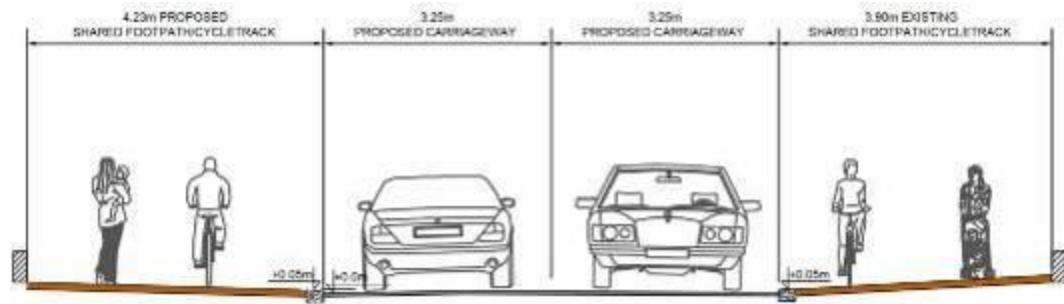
Typical Cross-section at Springfield Avenue
